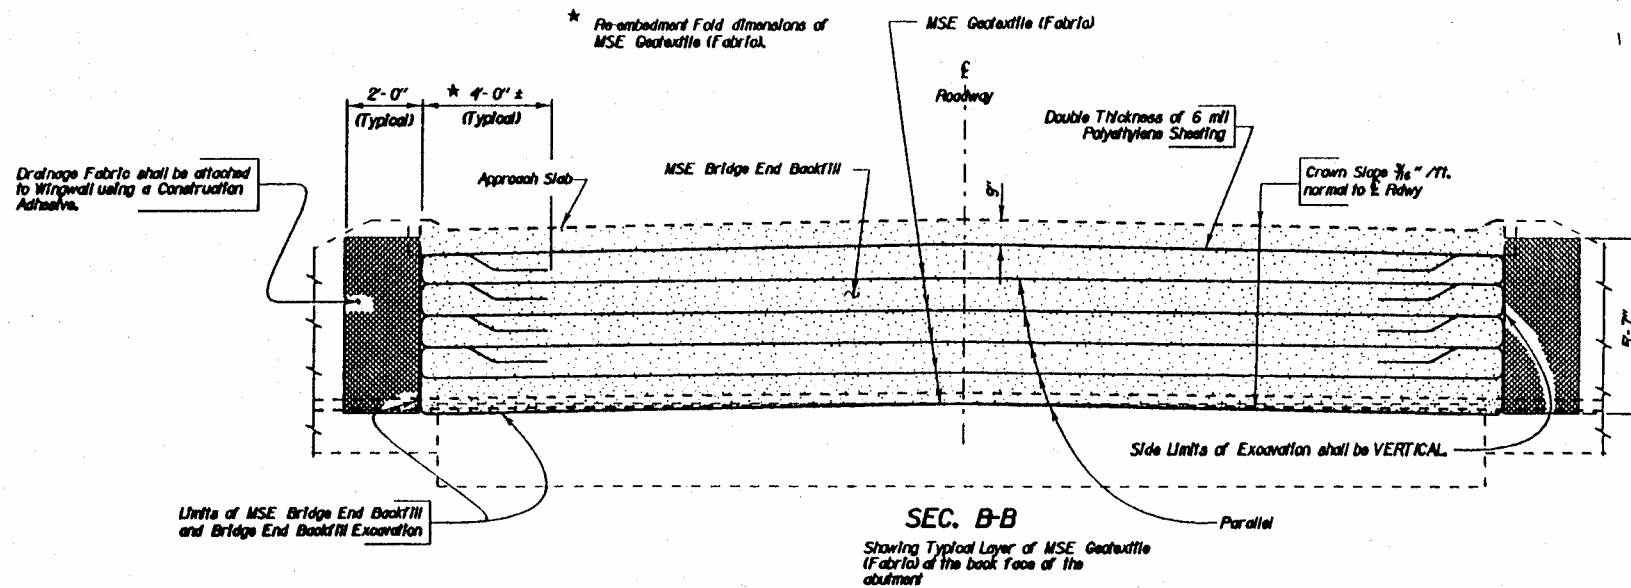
Design detail of a typical MSE geotextile reinforced soil wall from the back showing the side wraps and the drainage fabric along the wing walls prior to 1999
